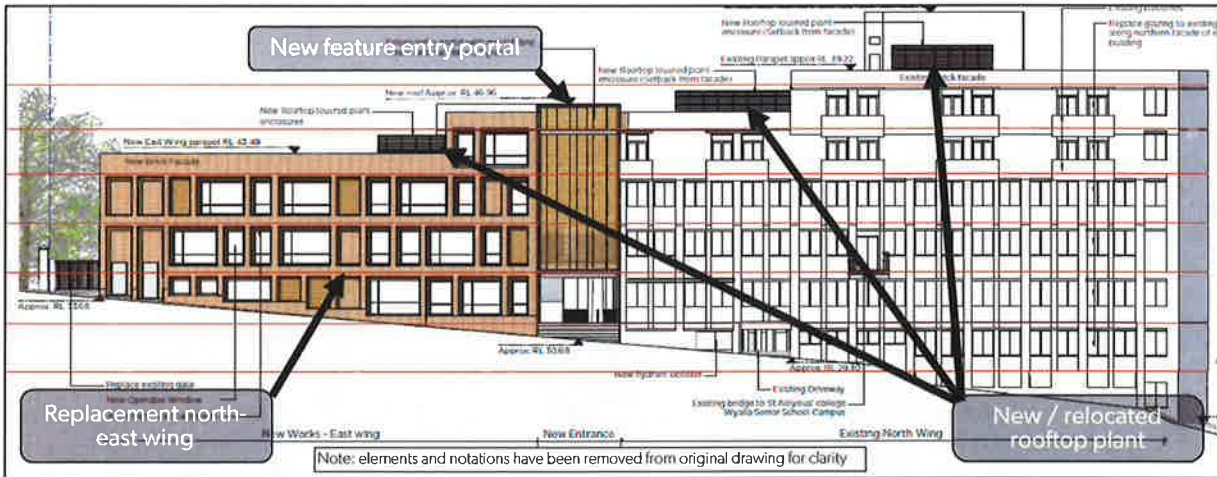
| Main Campus – Proposed Upper Pitt Street (Northern) Elevation (Source: Applicant’s RtS 2018)
